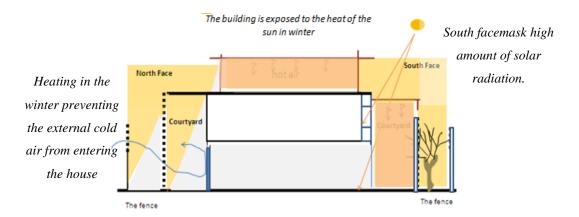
Heating in the winter; preventing external cold air from entering the house.
